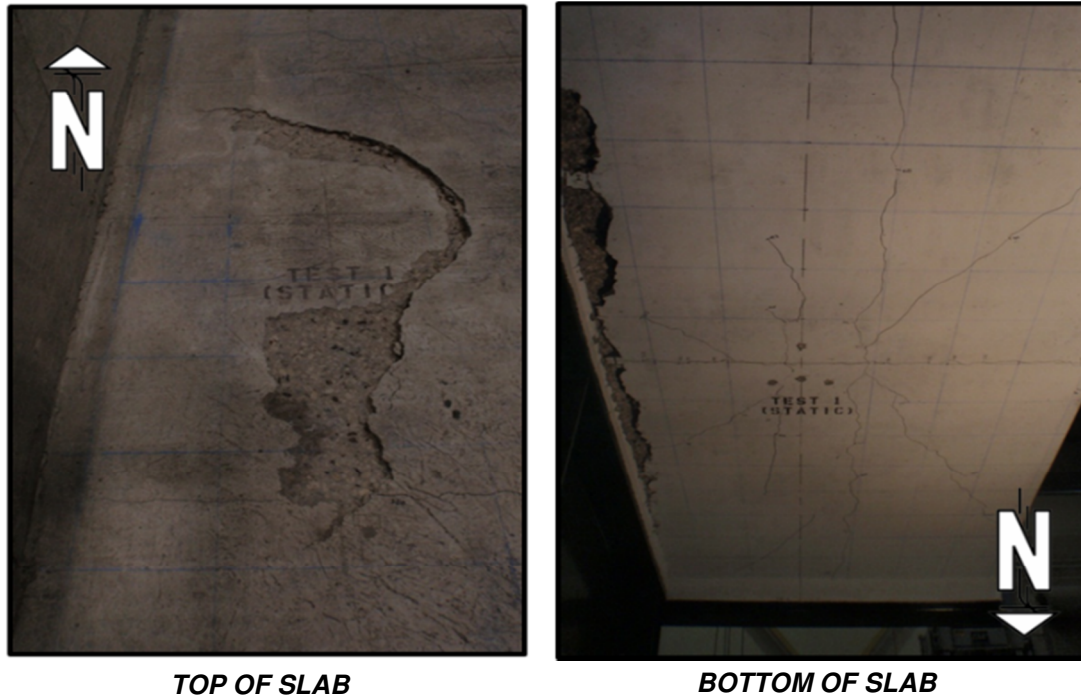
Top and bottom views of punching shear type failure for the cantilever section with steel reinforcement subjected to a static monotonic load
